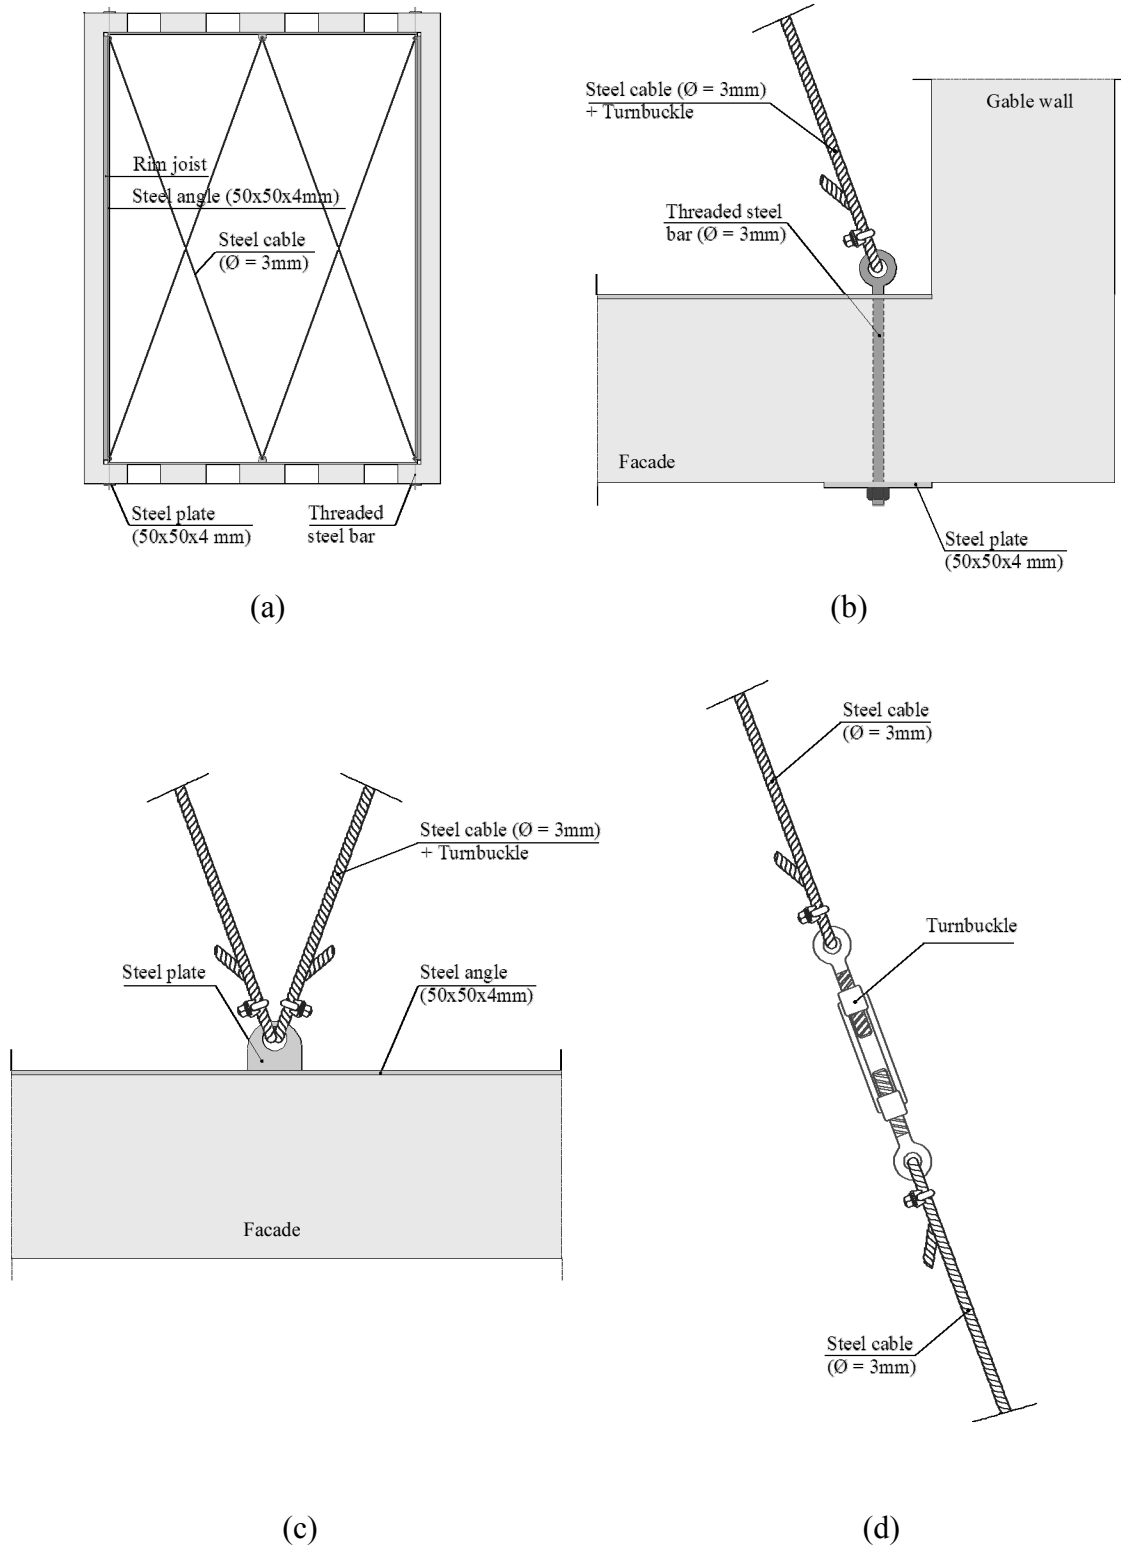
Steel cables of the strengthened mock-up: (a) plan of the two top floors; (b) connection of the cables to the corners; (c) connection of the cables to the middle of the facades; (d) turnbuckle.
